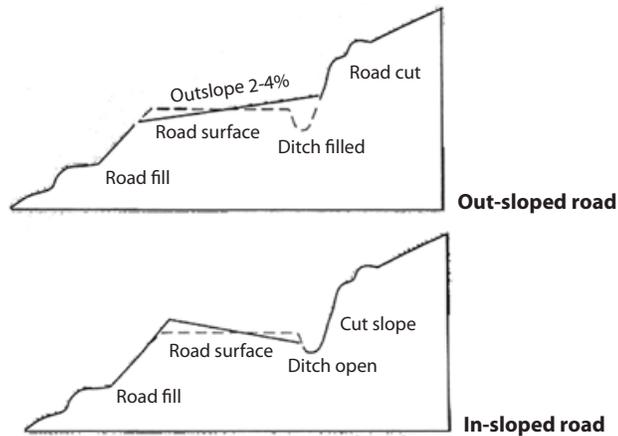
Out-sloped and in-sloped road cross-sections. *Source:* Adapted from Weaver and Hagens 1994, p. 47.
